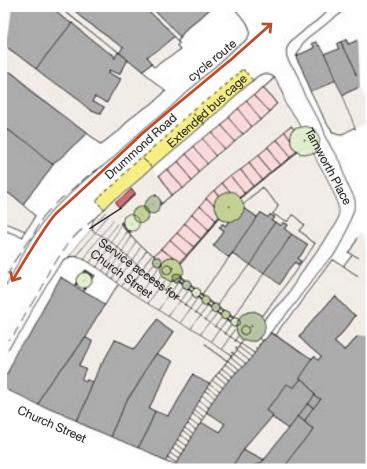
Plan of Ann's Place Car Park (East) consolidated car park and improved route to Church Street
